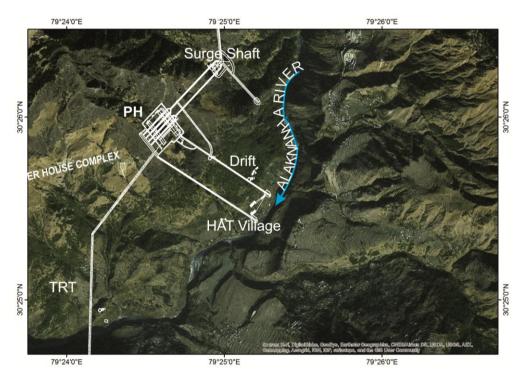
ArcGIS image of powerhouse area showing the layout of powerhouse
